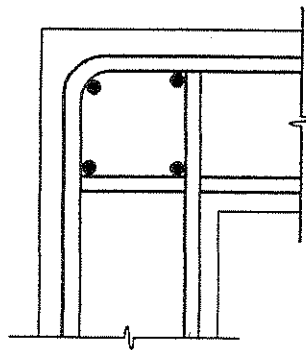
Suggested Detail of Knee Joint under Closing Moment
